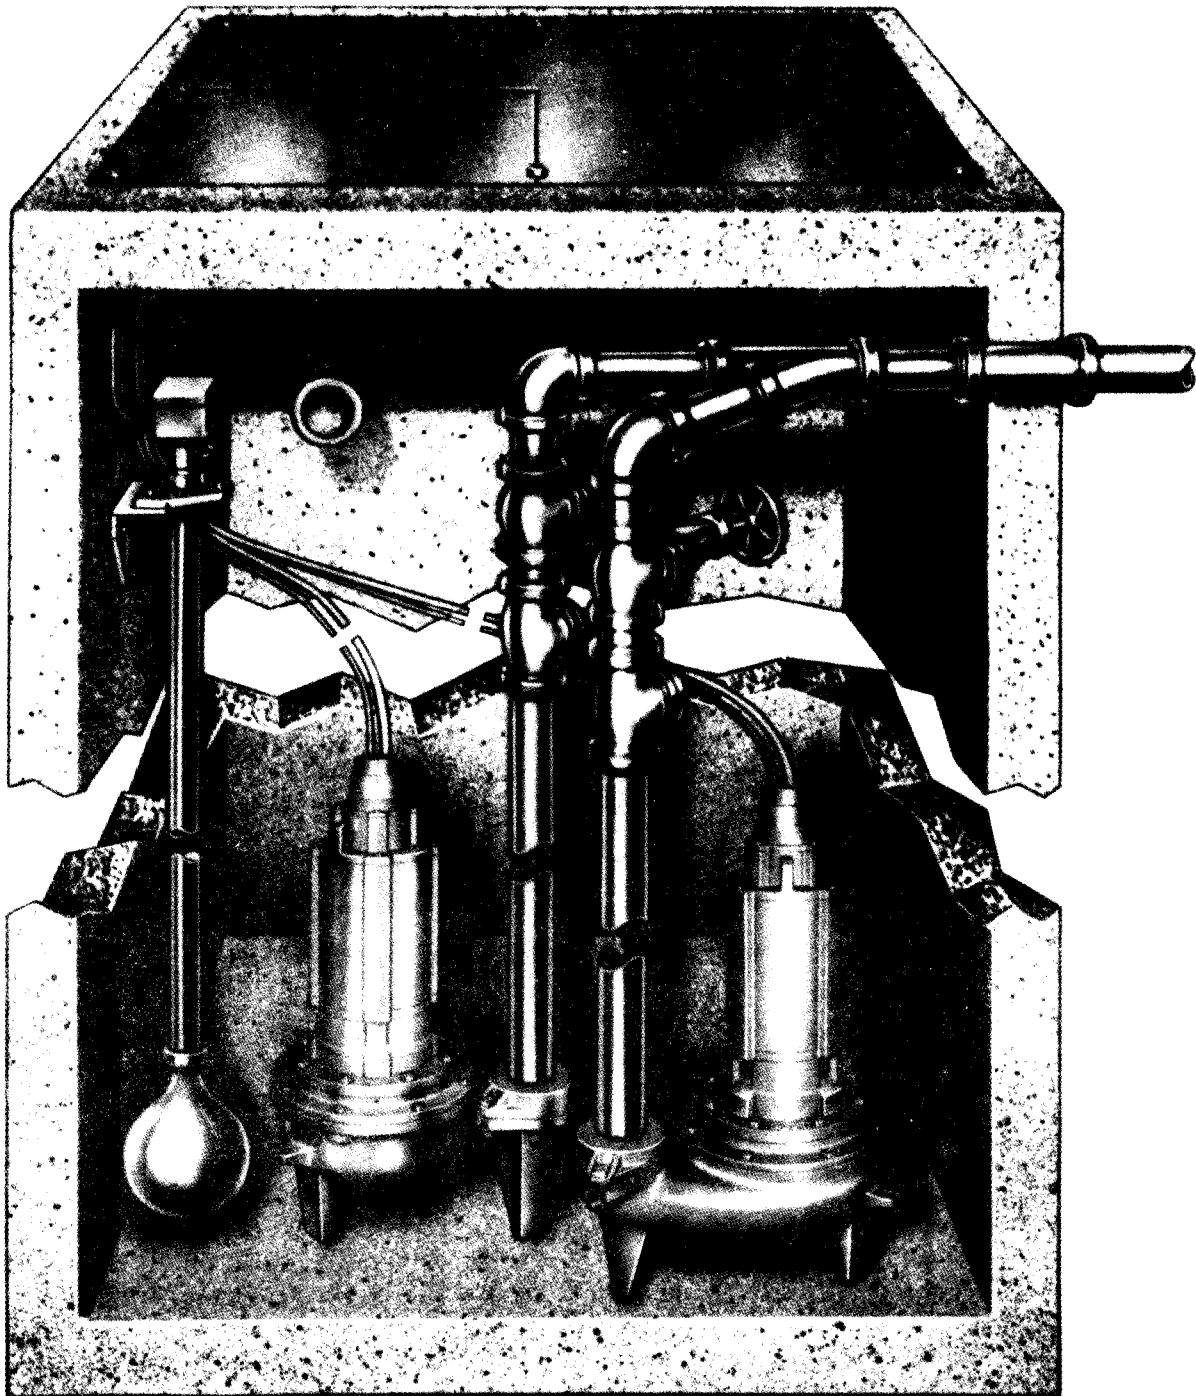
Typical vertical submerged type centrifugal pump installation.
